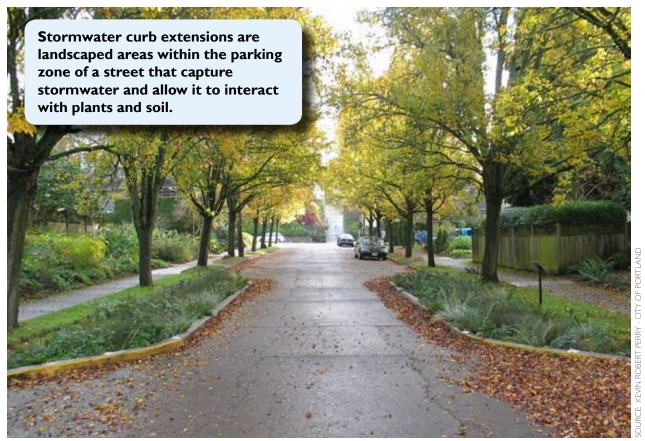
Stormwater curb extensions used on a residential street in Portland, Oregon.
